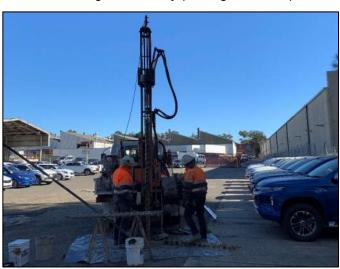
Lot 2 car park concrete and bitumen hard standing (east corner looking northwest).
